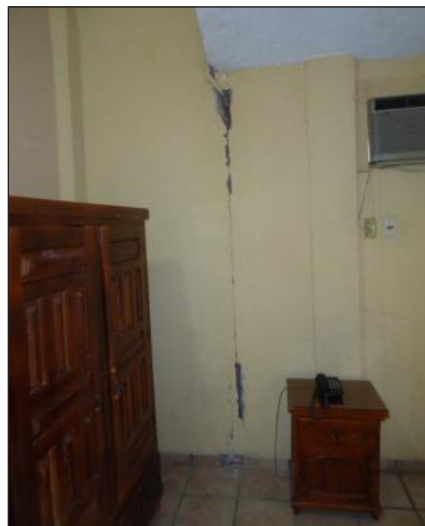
Cracking at the constructive joints and in infill masonry walls.
